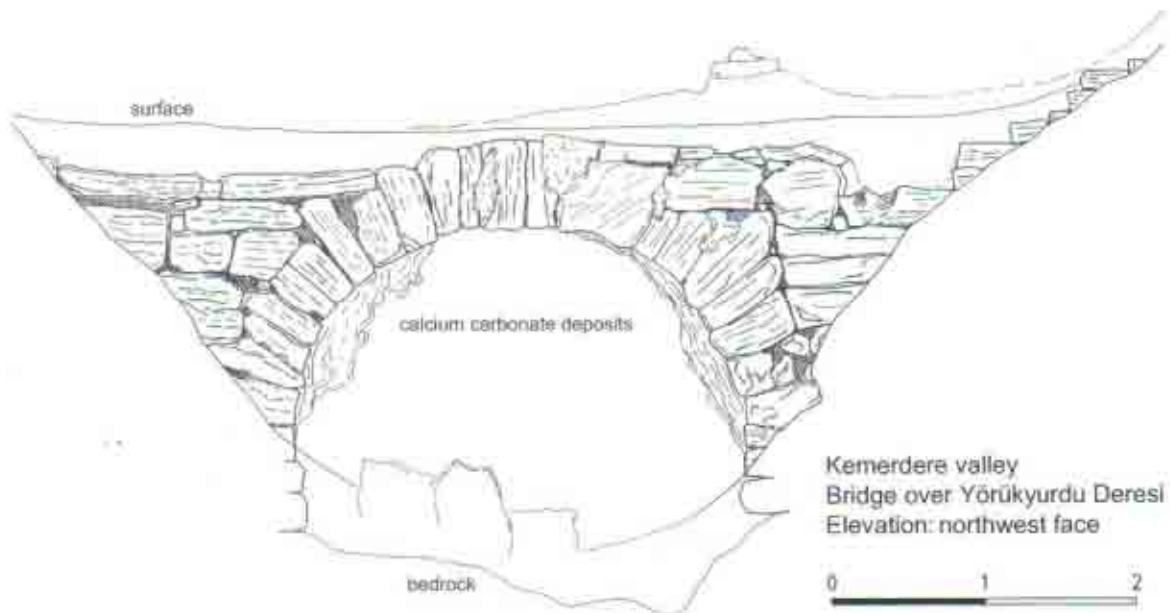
Elevation of the small bridge on the Yörükyurdu Deresi, northwest face. Illustration by Rüstern Aslan and Sinan Kılıç.
